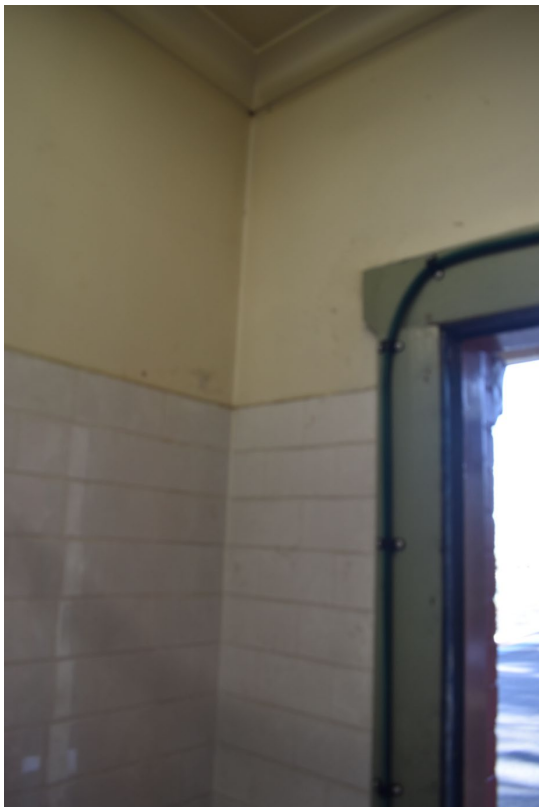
View of from the storeroom facing west. A cable is shown running along the door frame. Internal walls feature subway tiles to approximately 2m in height.
